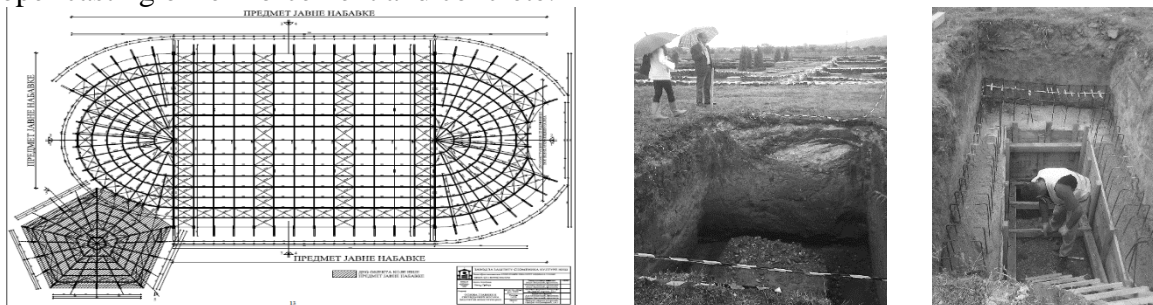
Initial design, disposition of GLW construction, excavation for foundations and casting phase
